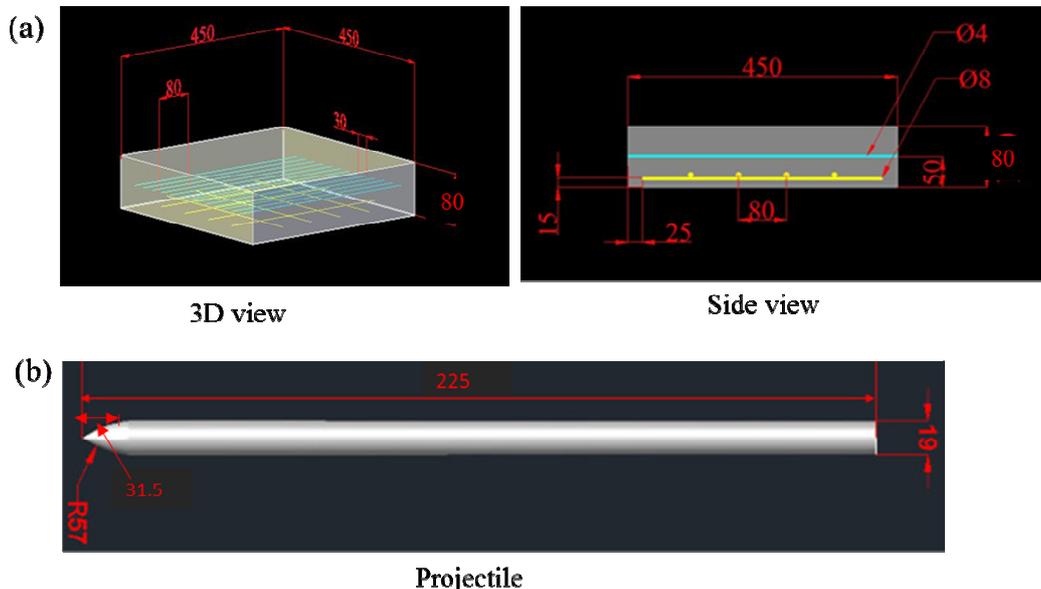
Detailing of (a) pre-stressed concrete target (All dimensions in mm) (b) projectile
